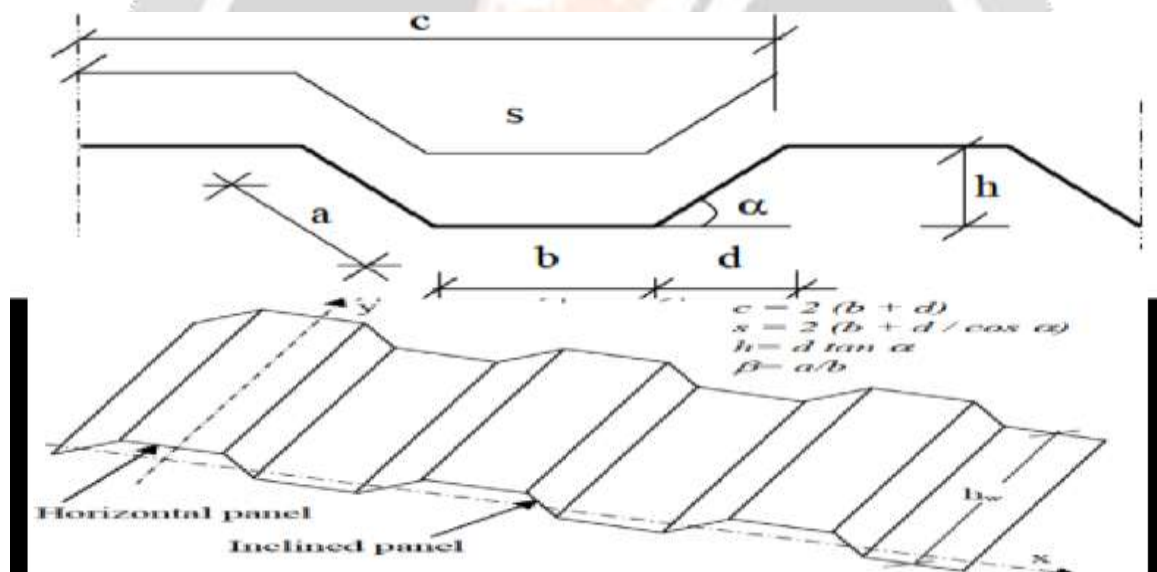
Trapezoidal corrugated steel plate cross section and dimension notations. Table 3.7 Corrugation dimension parameter (in mm)
